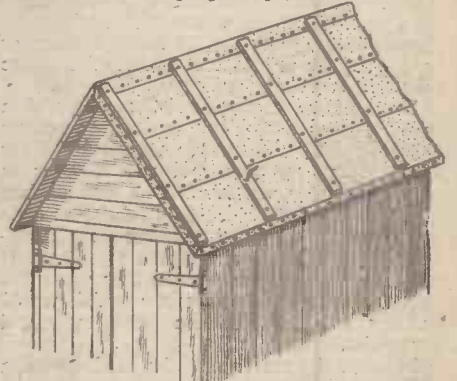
For a span-roof shed, the felt is laid, as shown. If the shed is much exposed to wind it is a good plan to fix laths over the felt, as indicated.
